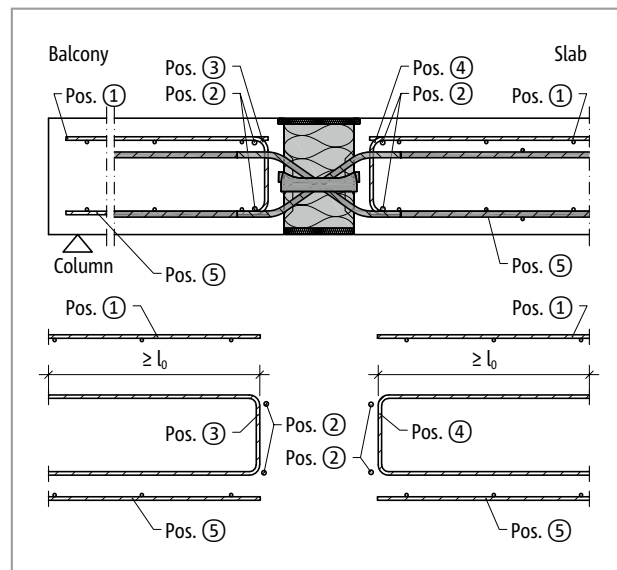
Schöck Isokorb® XT type Q-VV5 to VV11 on-site reinforcement
